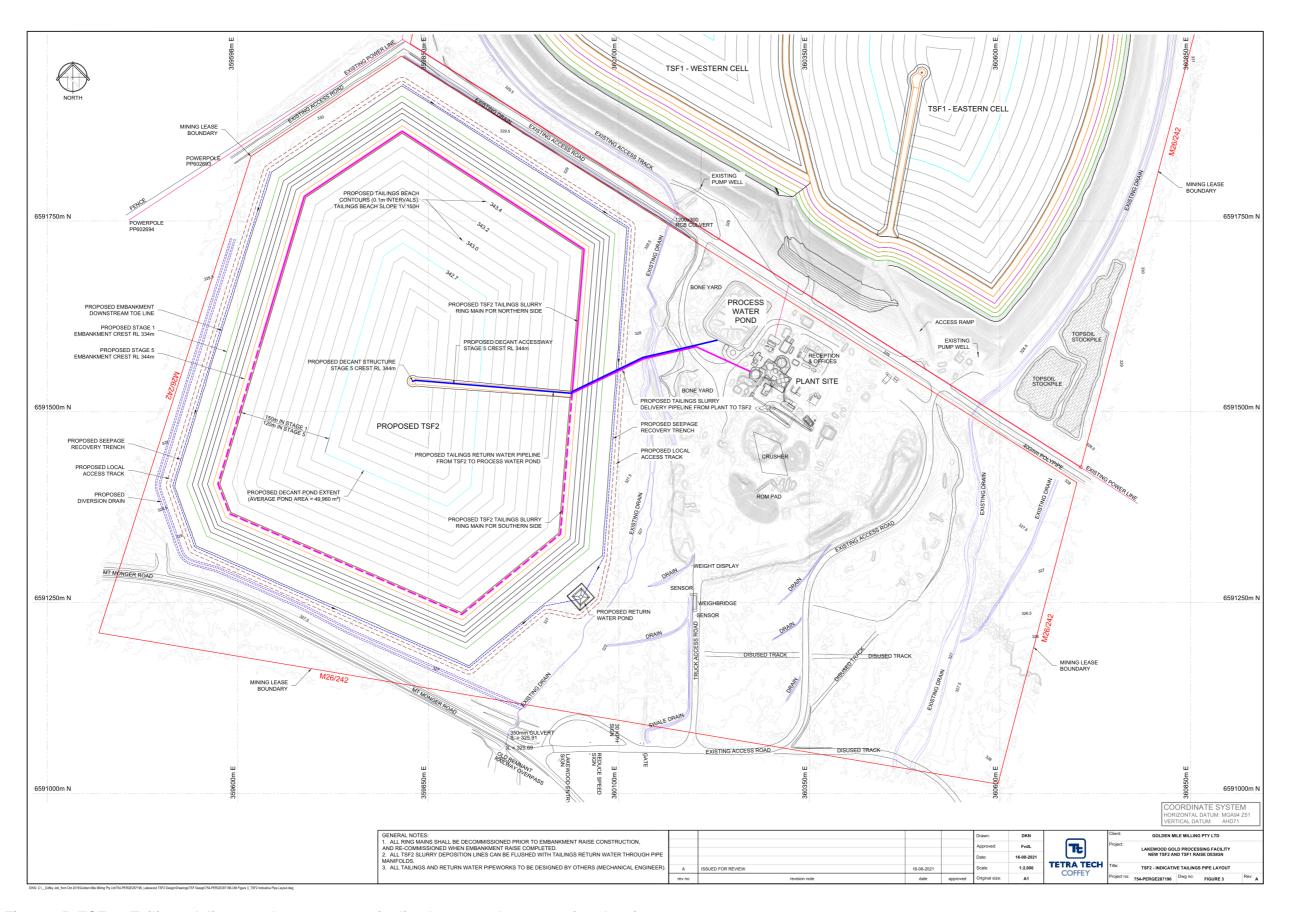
TSF2 - Tailings delivery and return water pipeline layout and construction drawing
